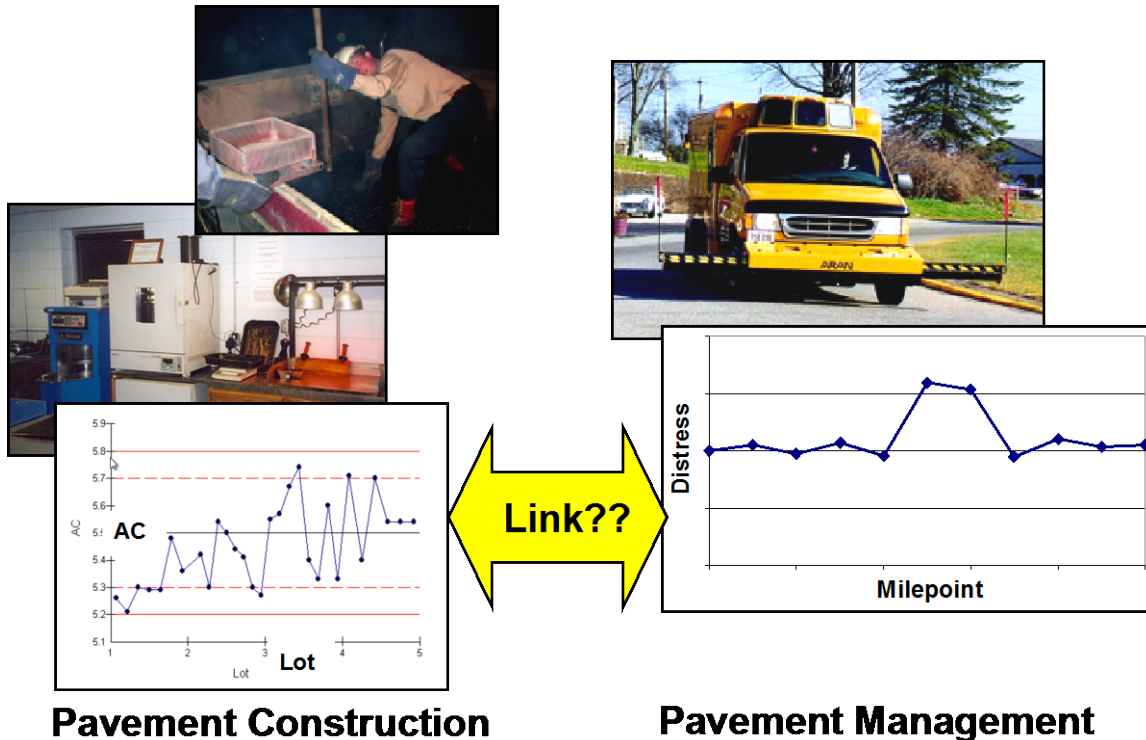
Illustration. Referencing problem in linking pavement construction and pavement management data.
